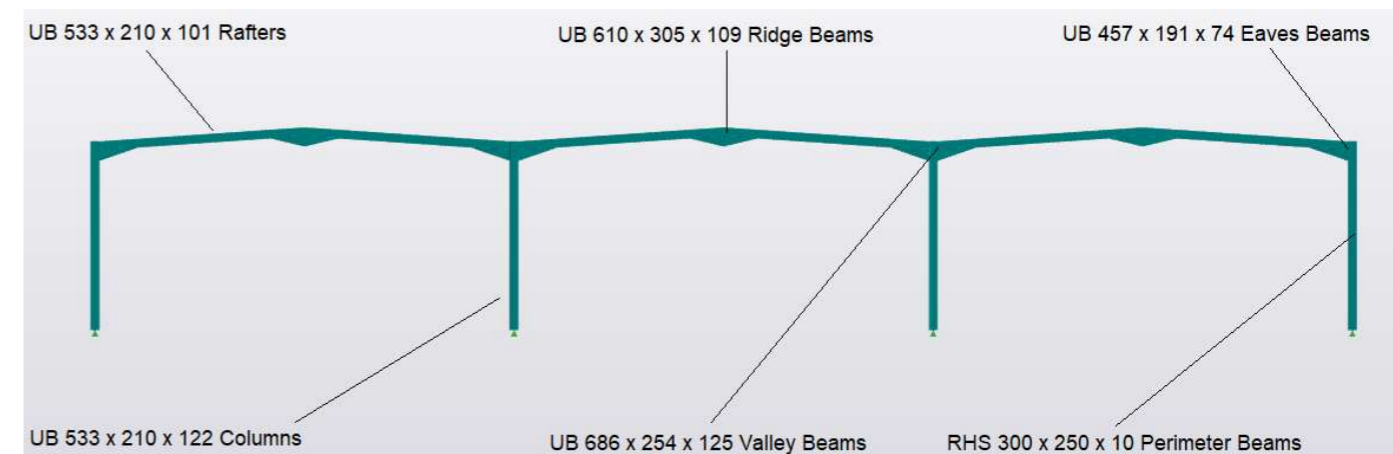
Typical Section Through Unit (Portal Frames at 13.585m Centres)
